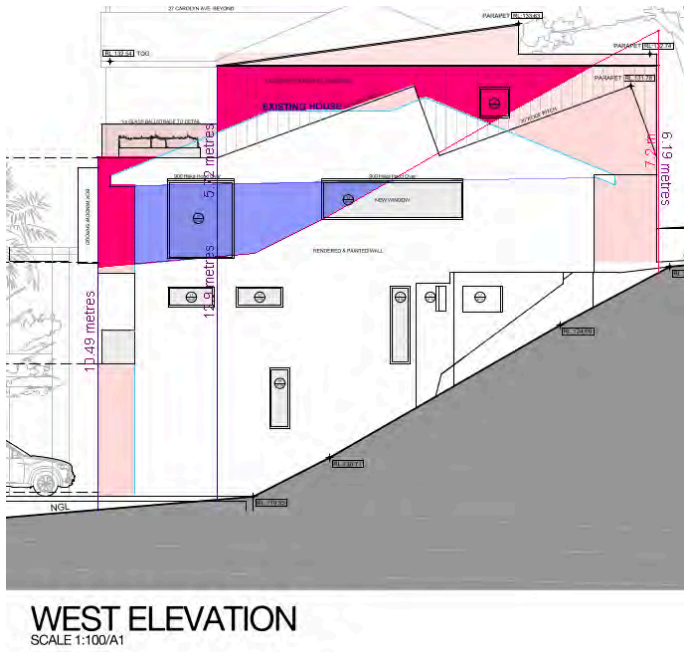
Proposed western elevation wall height breach. Extent of breach indicated by pink shading (existing approximate breach indicated by purple shading).
